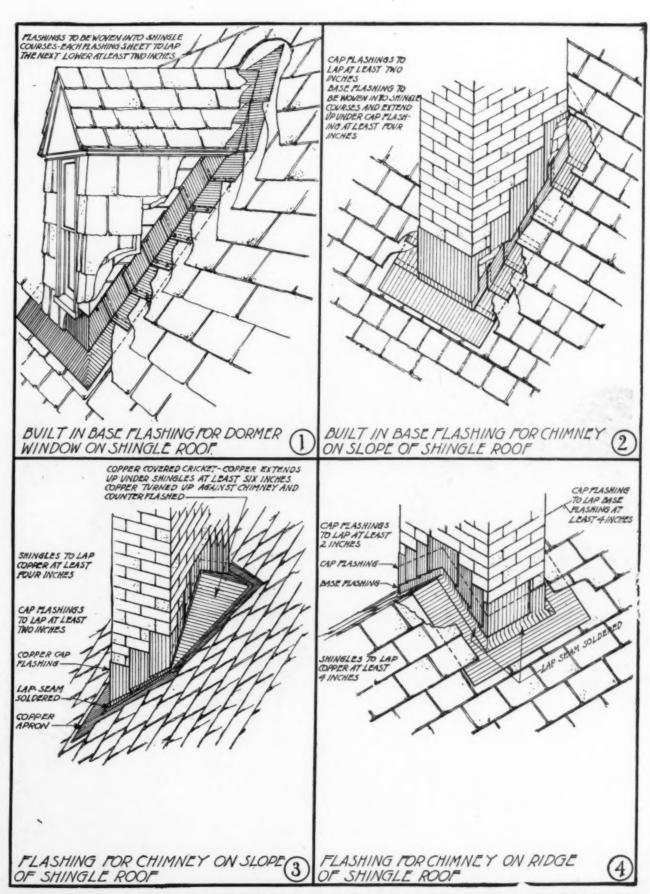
The flashing for a dormer window covered with shingles and on a shingle roof is shown in Fig. 1. Flashing sheets should be so placed that each sheet will lap the one below at least two inches and be separated by one shingle thickness. Sheets should extend up on the walls at least four inches and be nailed near the top with one or two copper nails as shown. Flashings will not be visible on the roof or walls except on the roof below the front wall where they lap over the top of the shingles four inches. Care should be taken to see that each sheet extends above the shingle on which it rests so it may be nailed without puncturing the shingle.
